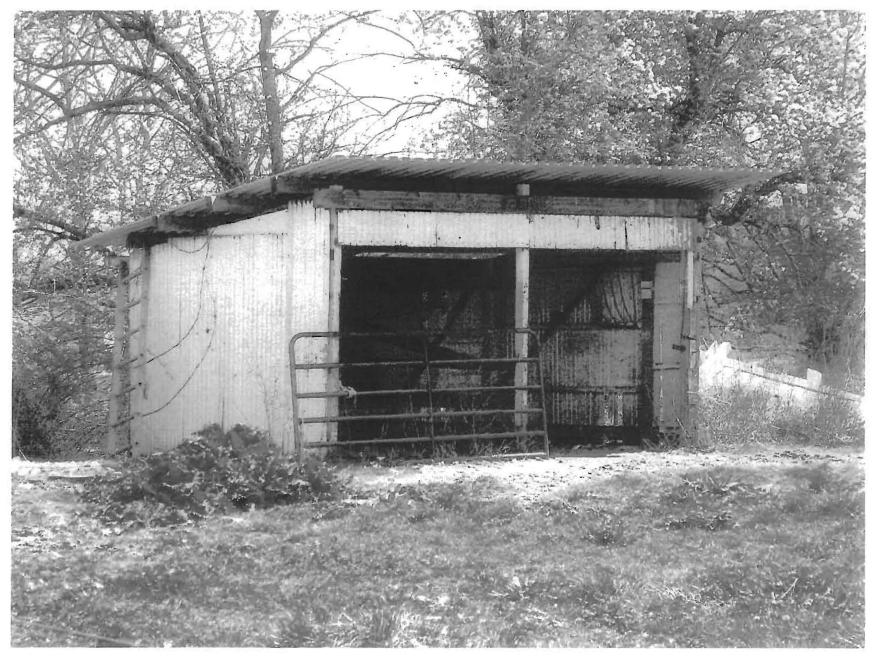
Existing Storage Shed located next to Picture #1 and adjacent to the pasture.
